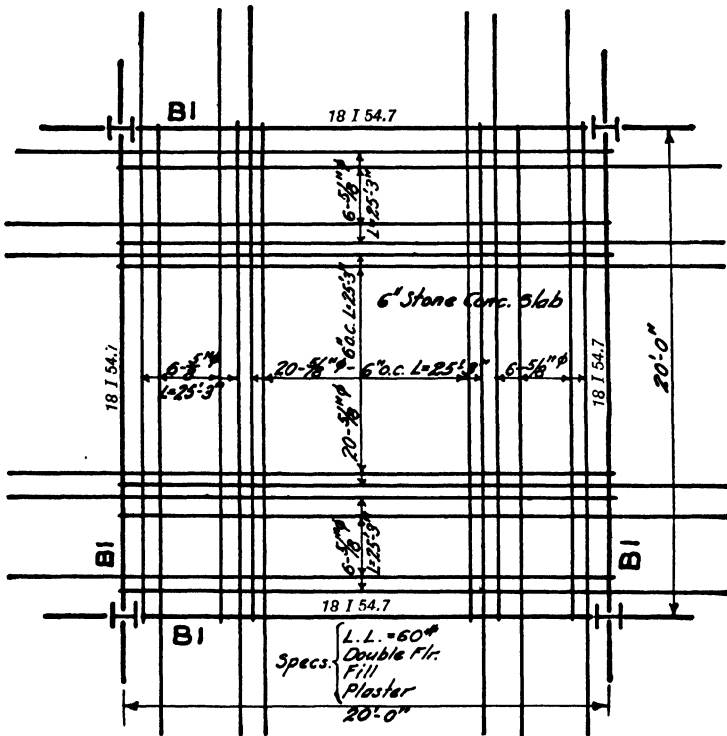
Framing for Two-Way Stone Concrete Slab in Concrete Frame.
